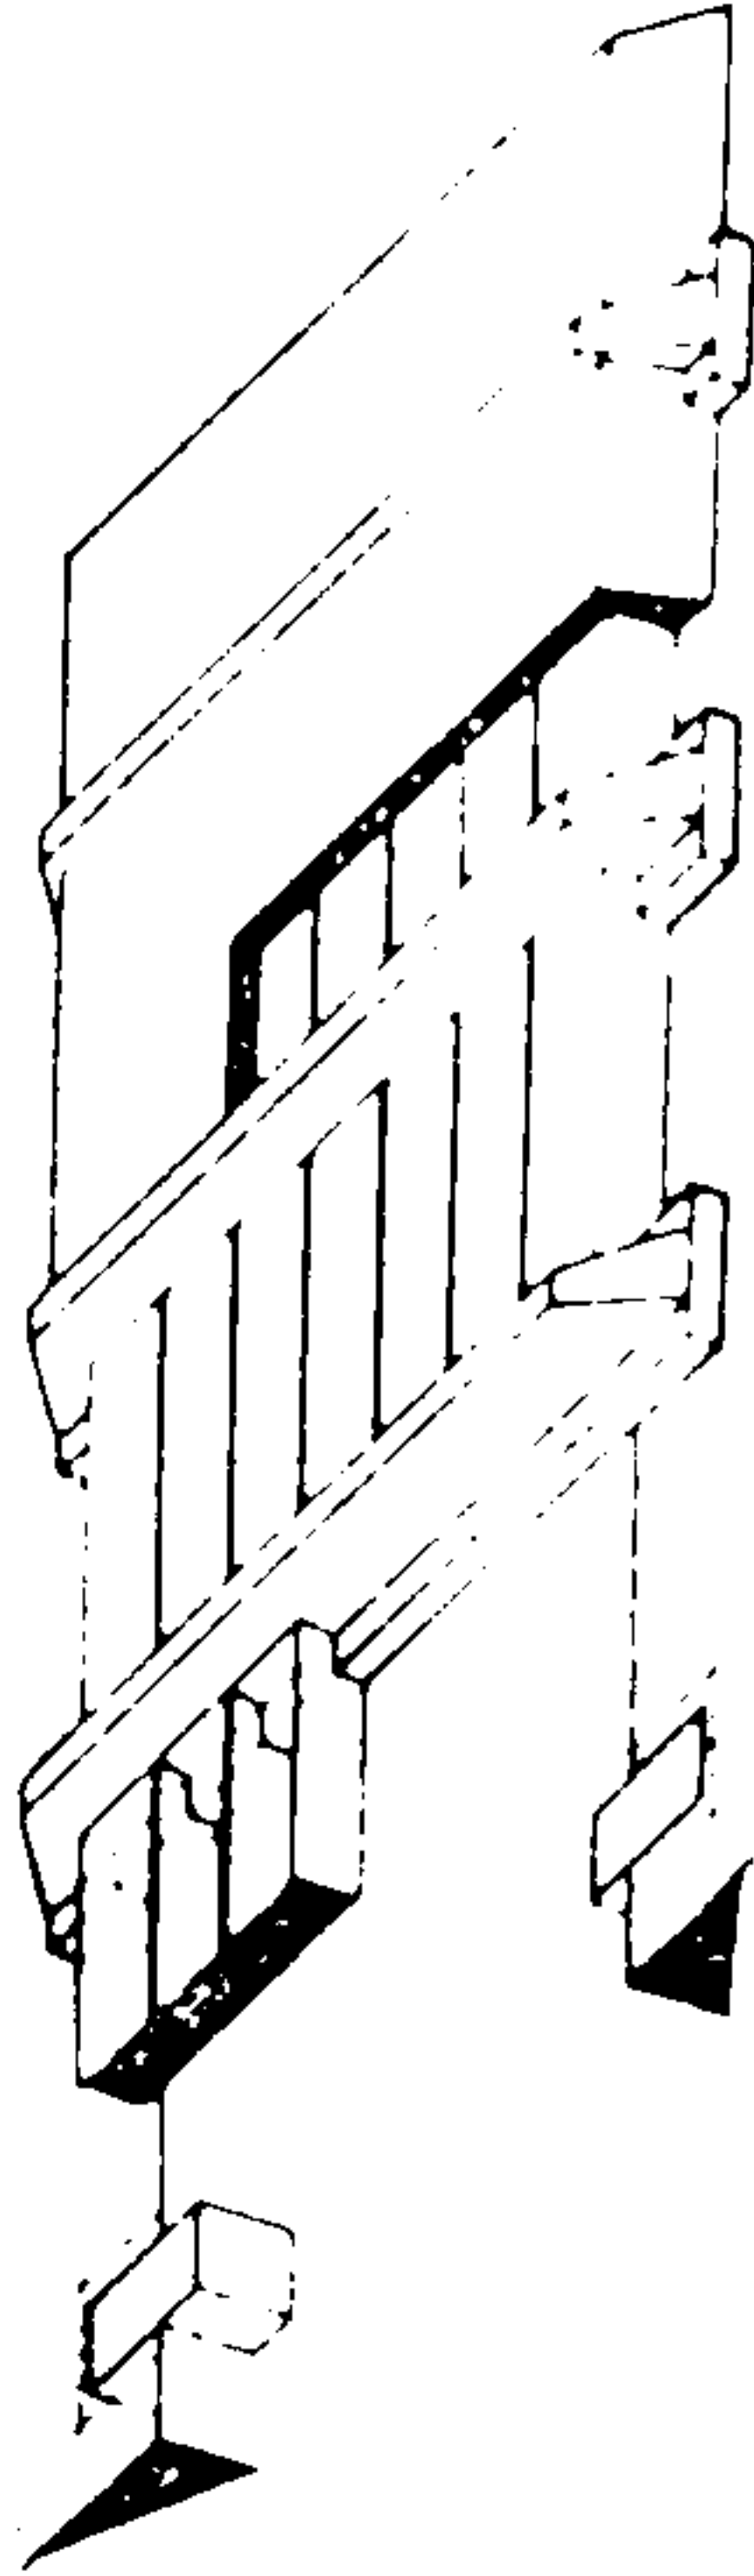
Vijayanagara. Lotus Mahal, flat ceilings spanned by inverted T-beams
